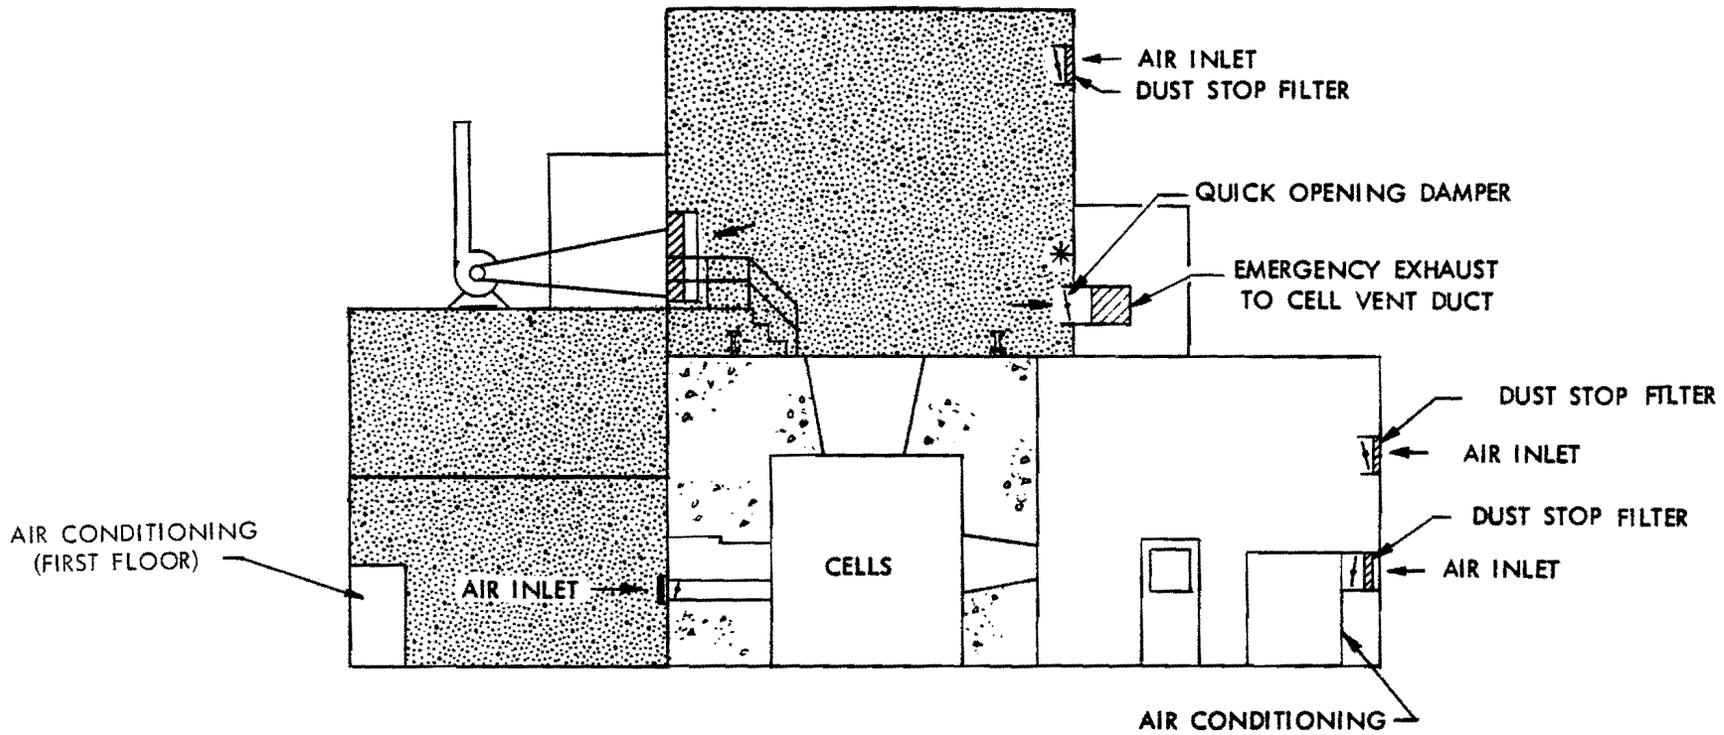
BUILDING 4507 SECTION VIEW VENTILATION SCHEMATIC
